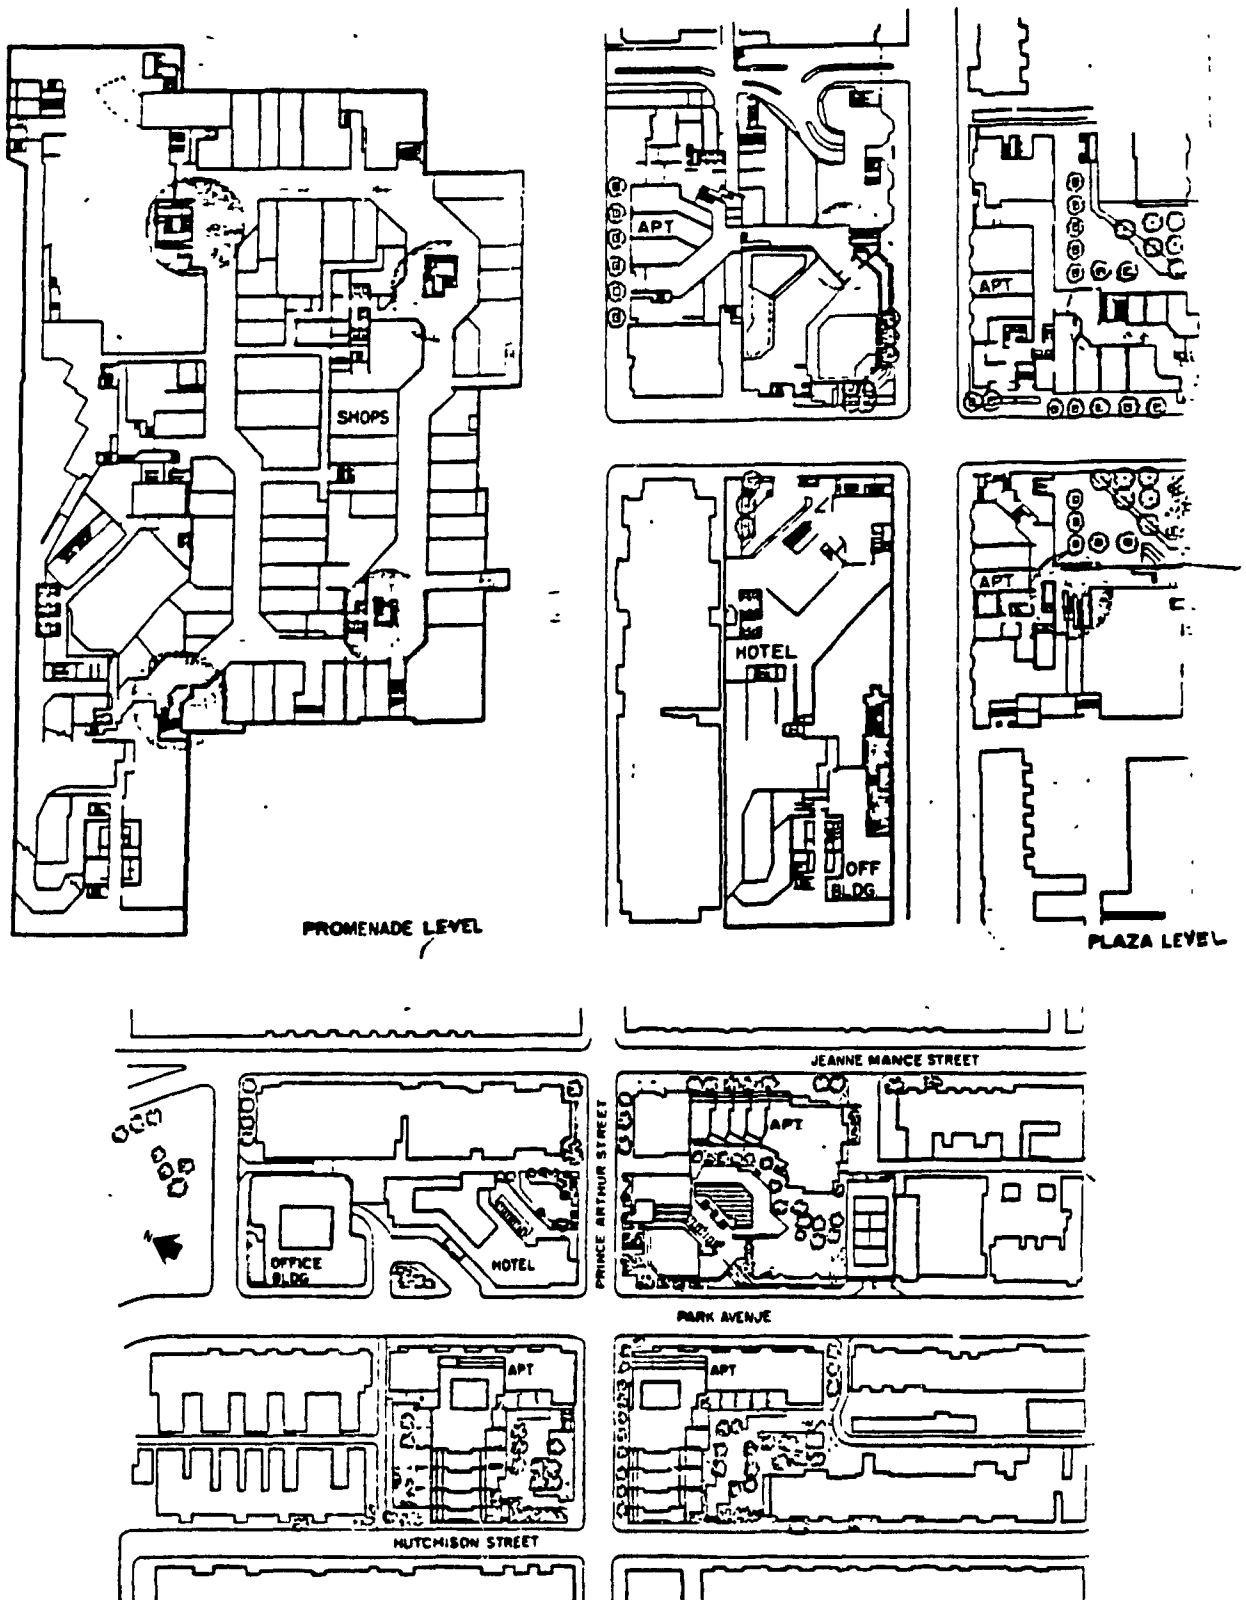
Plans of promenade level, plaza level, and street level, La Cite, Montreal.
